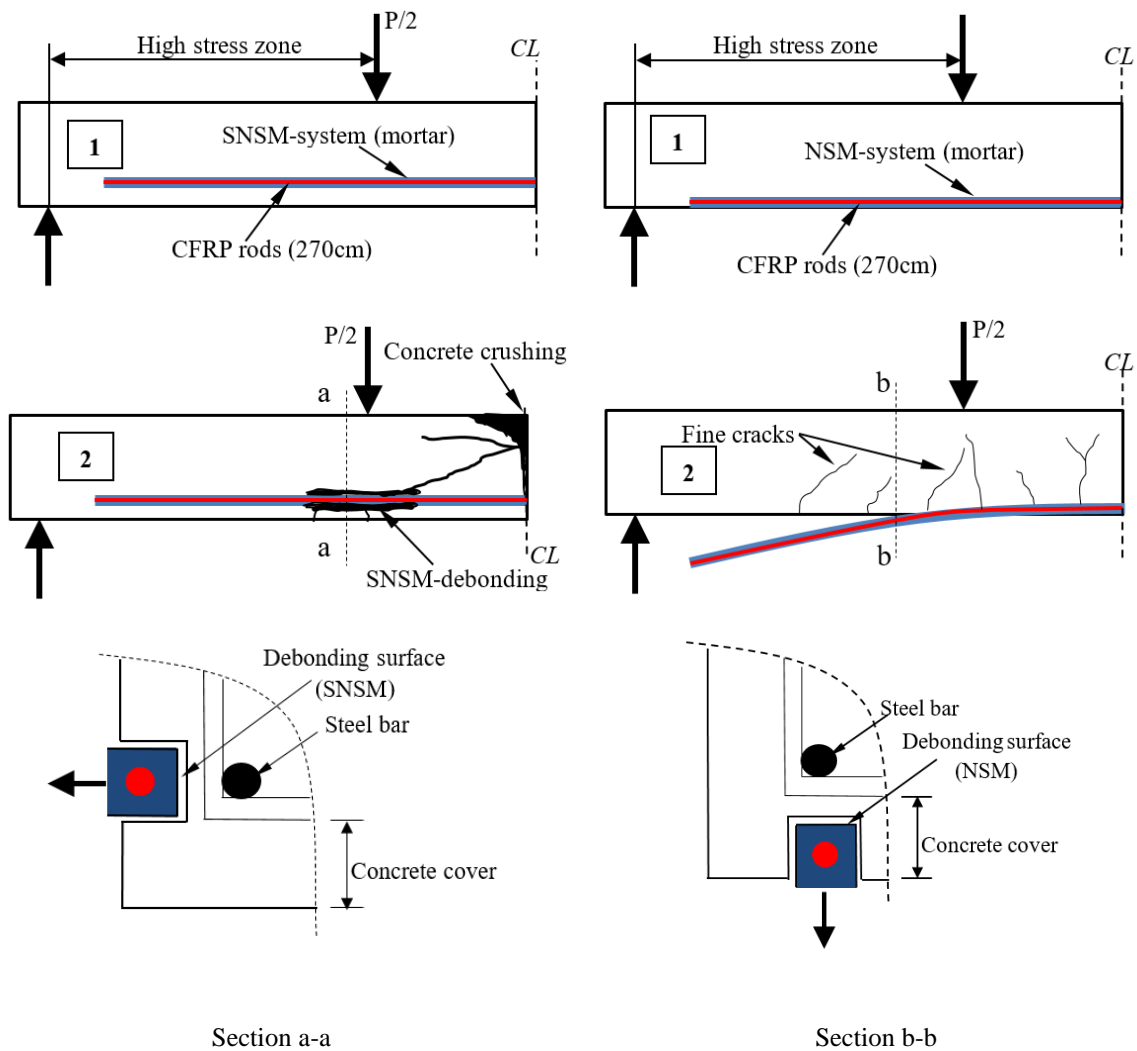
Debonding failure mechanism of a) BC3(270-SM) beam and b) S-C6(270-M) beam
